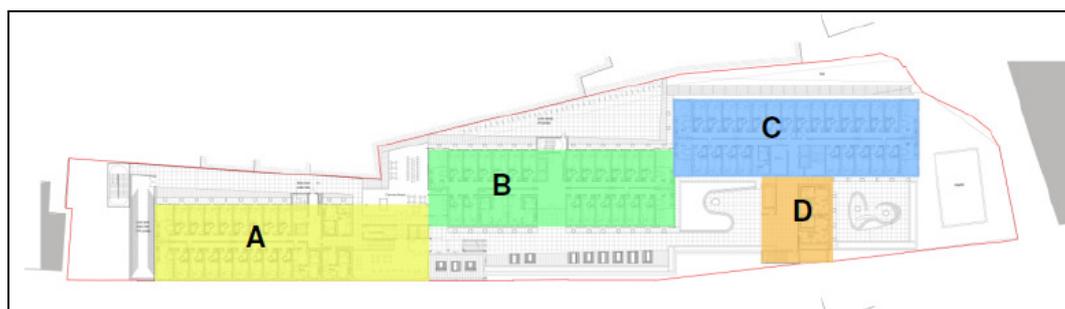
Block layout plan of buildings (source: submitted Design and Access Statement)
